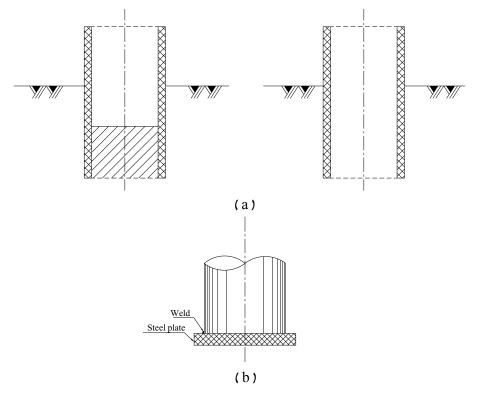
Plan view of the pipe pile: (a) open–end pipe pile and (b) closed-end pipe pile
